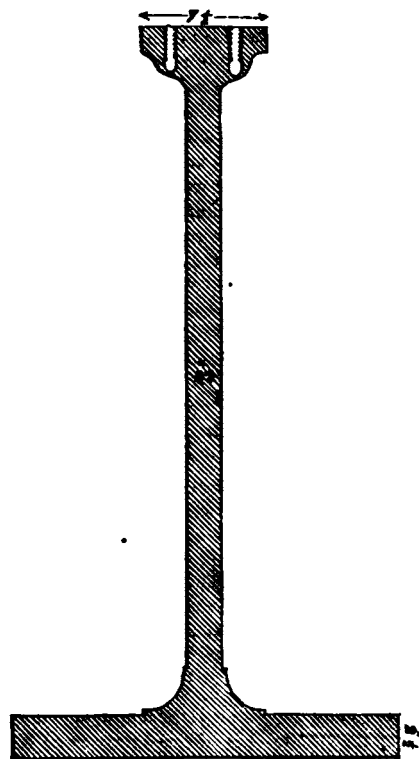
Section at Fracture A. Depth 3 ft. 9 in.
